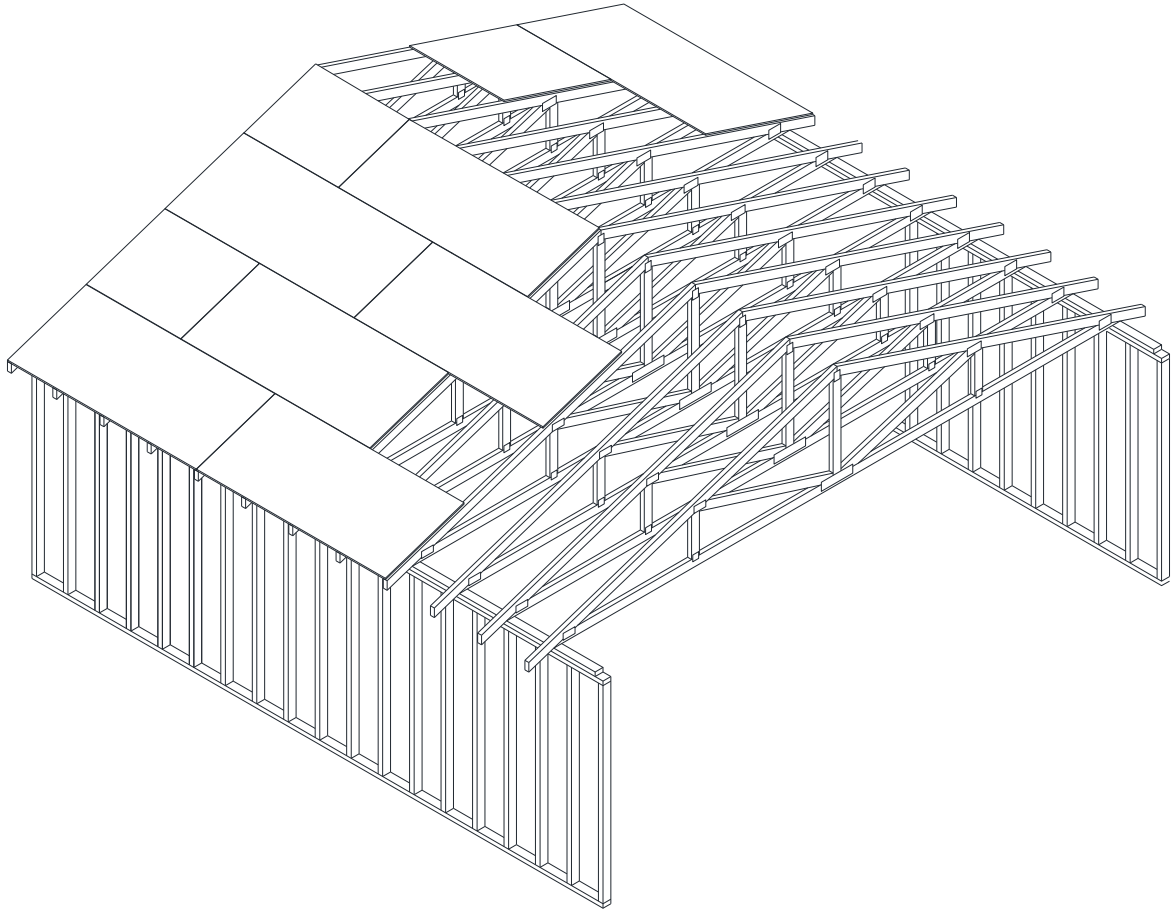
RESIDENTIAL ROOF STRUCTURAL SYSTEM. SOME OF THE ROOF SHEATHING AND STUD WALL OMITTED FOR CLARITY
